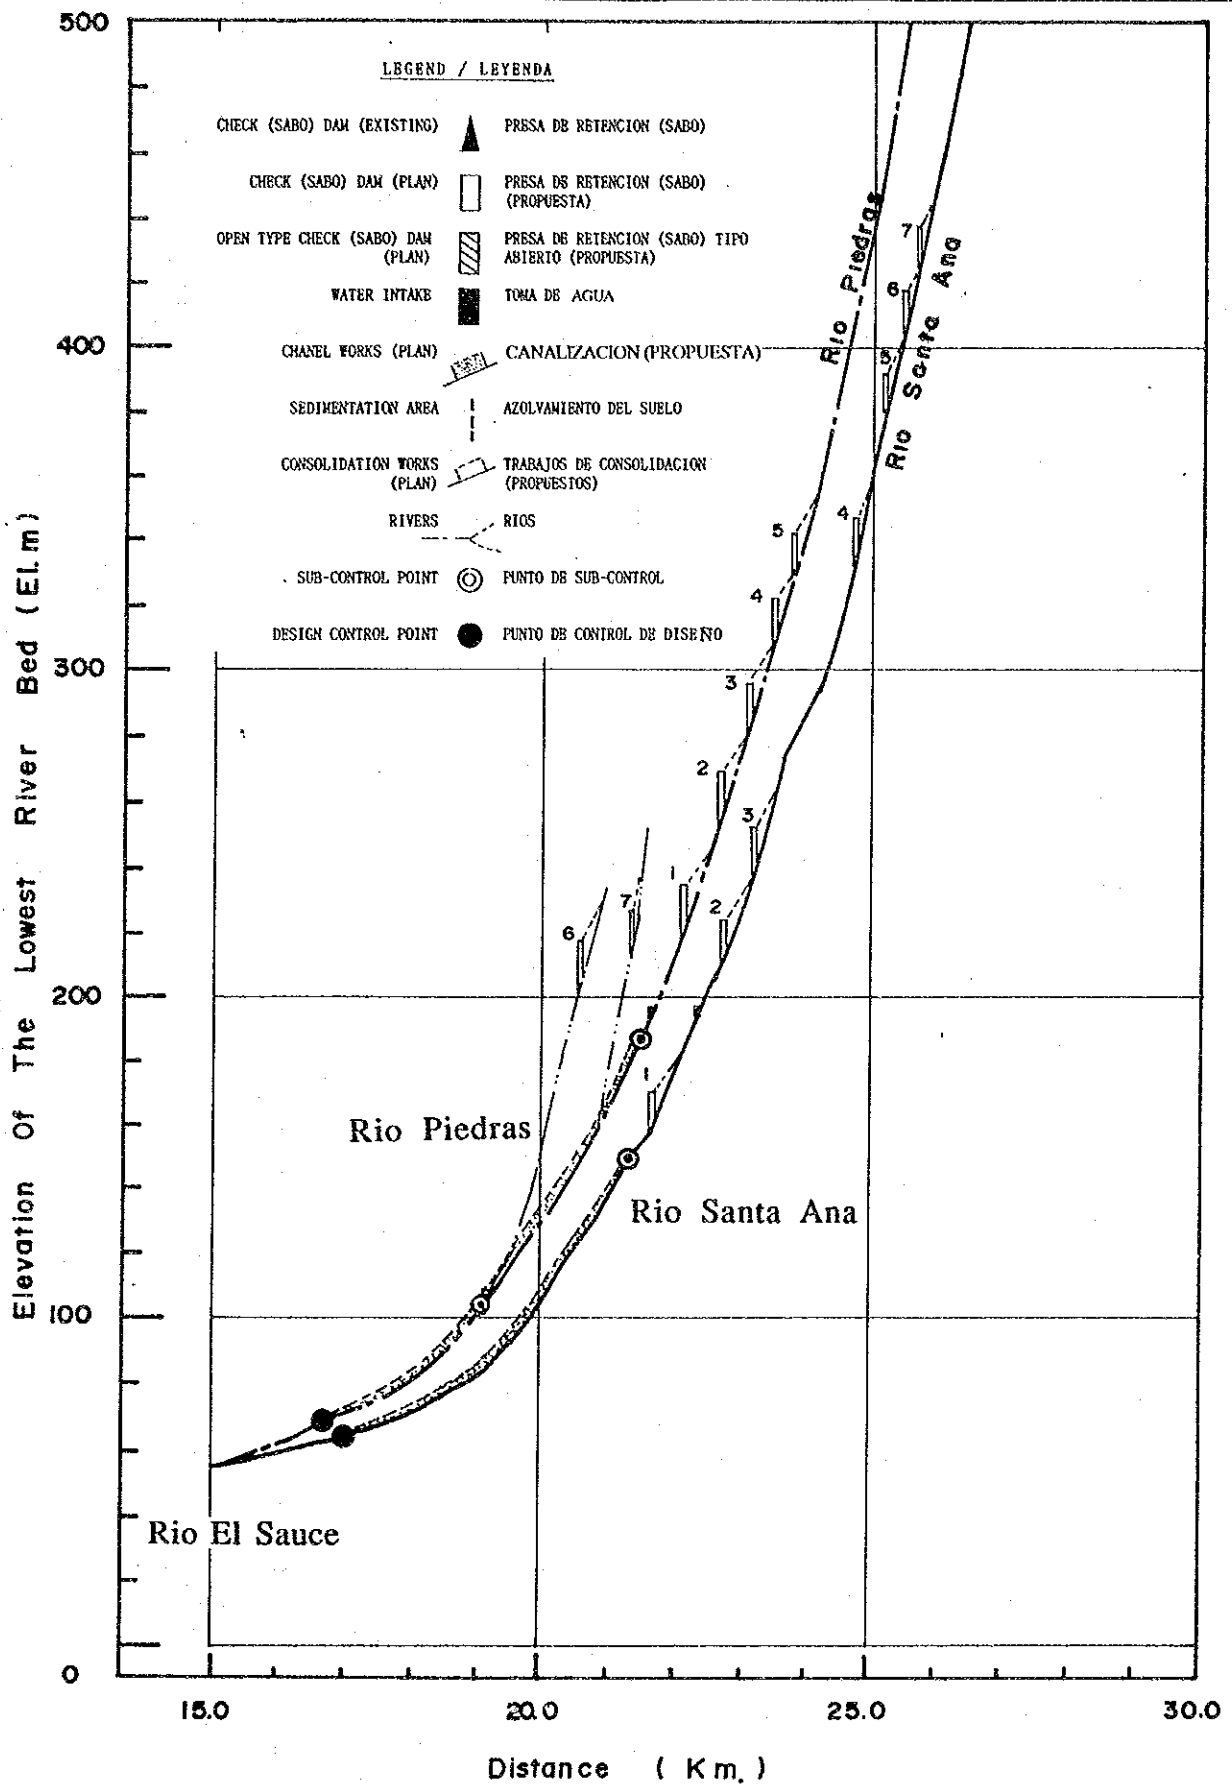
(3) LONGITUDINAL PROFILE OF EROSION CONTROL FACILITY ARRANGEMENT (RIO EL SAUCE)
